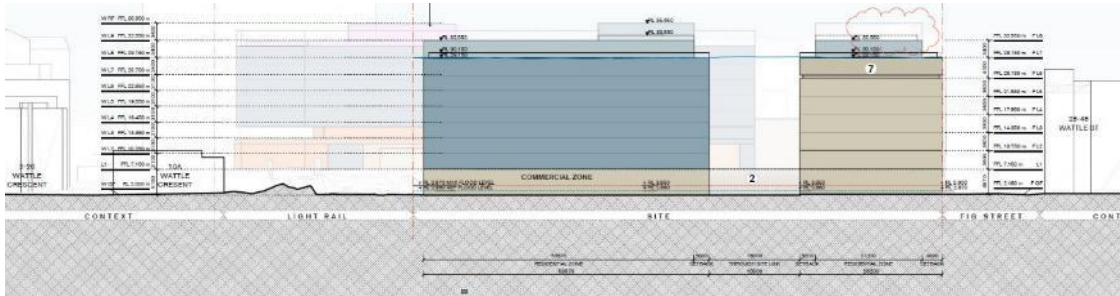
Envelope plans: Approved and proposed Fig Street Elevation
